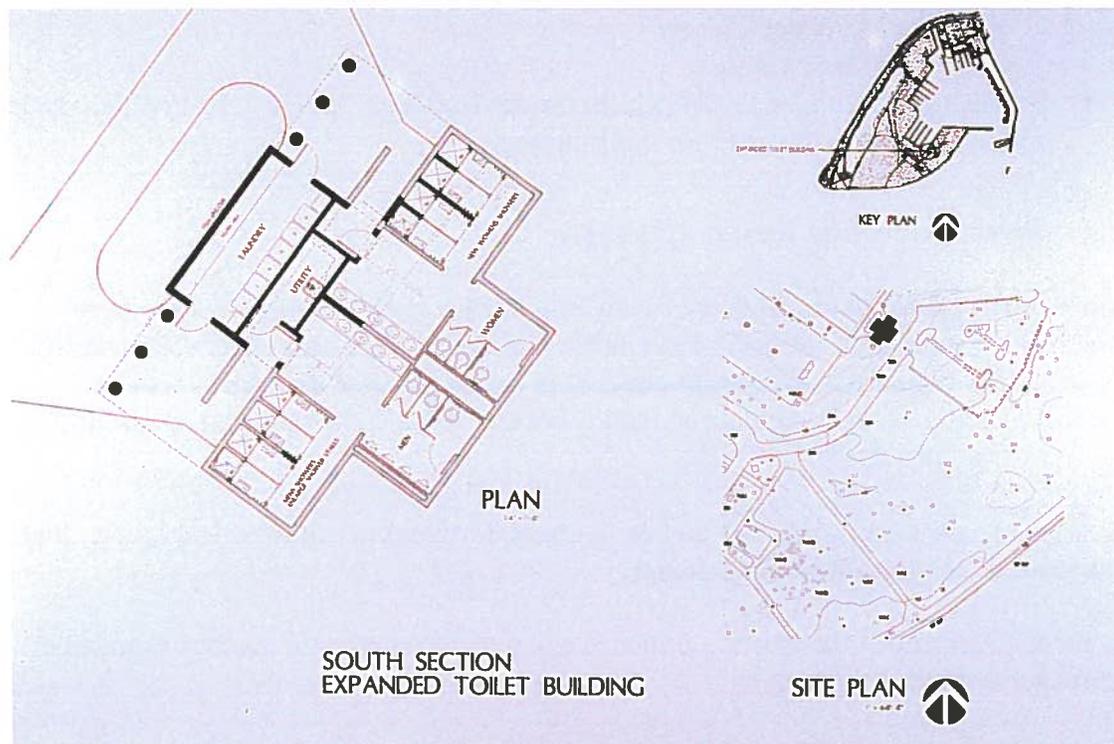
Proposed South Section Slip Tenant Restroom Expansion
